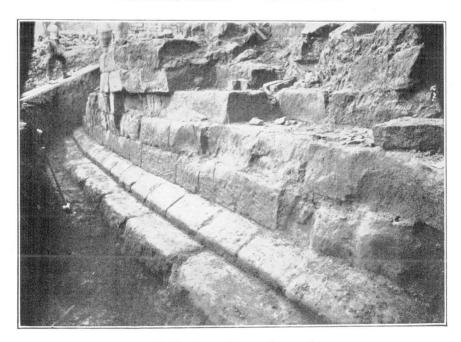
Roman Wall, looking south. Foundations below footings not exposed
